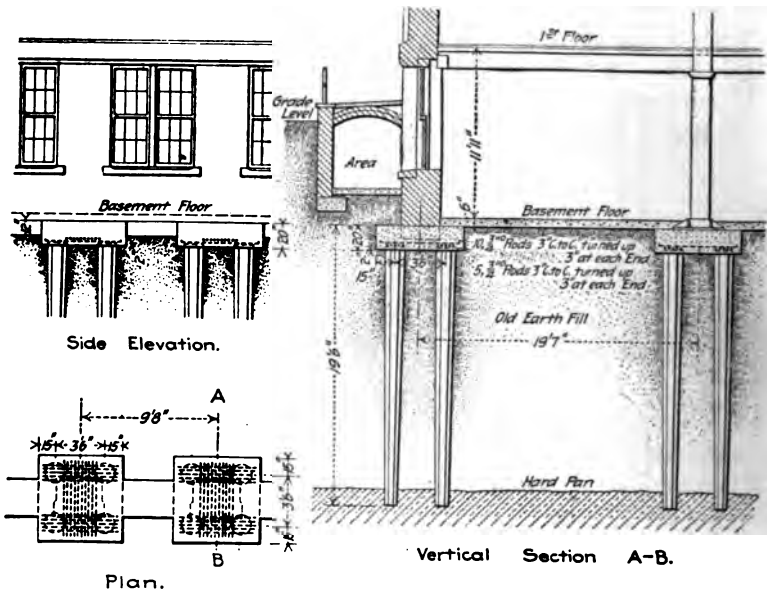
Gilbreth Pile Foundation for Lattemann Building, Brooklyn, N. Y.
